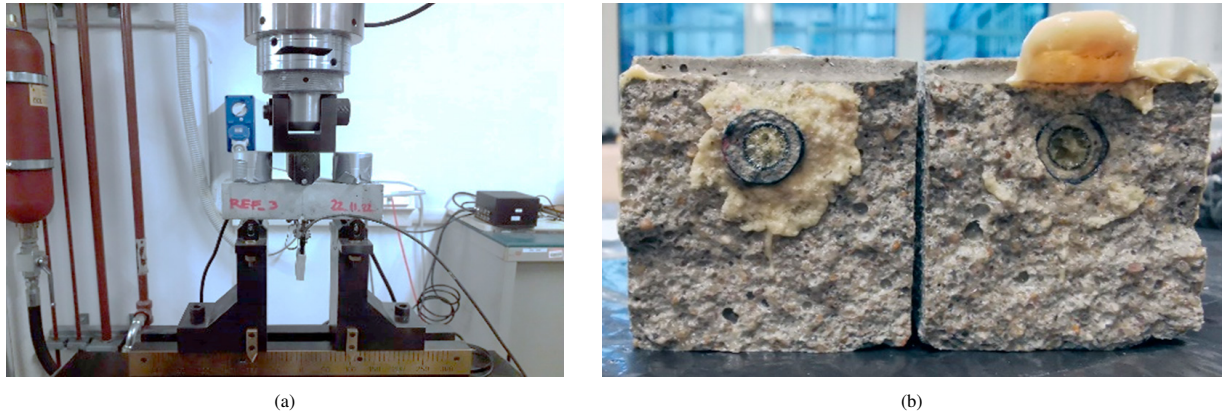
A REF specimen during the test with the AE sensors mounted (a) and the cross-section of a broken PUC specimen after the test (b).
